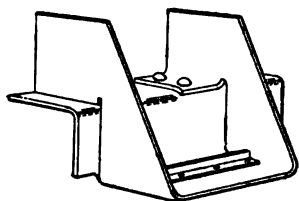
Duplex Wall-hanger for Large Wooden Girder
